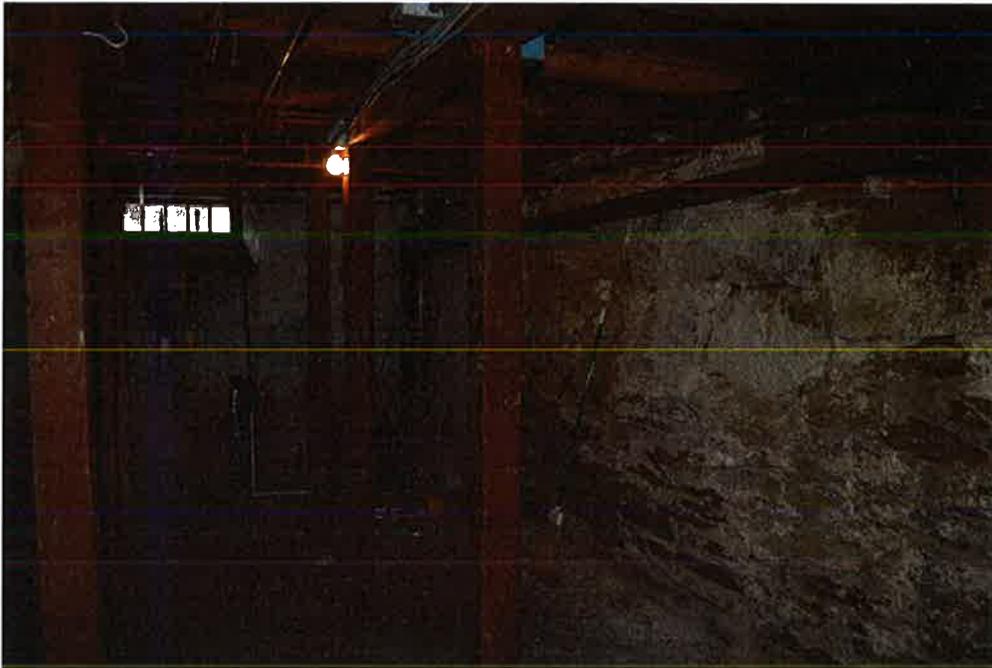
Cellar looking northwest, showing the west and north fieldstone foundation walls, floor joists, square wood posts installed in late twentieth or twenty-first century, and the five-light transom, where a full-size window at the north side of the foundation was once located.
